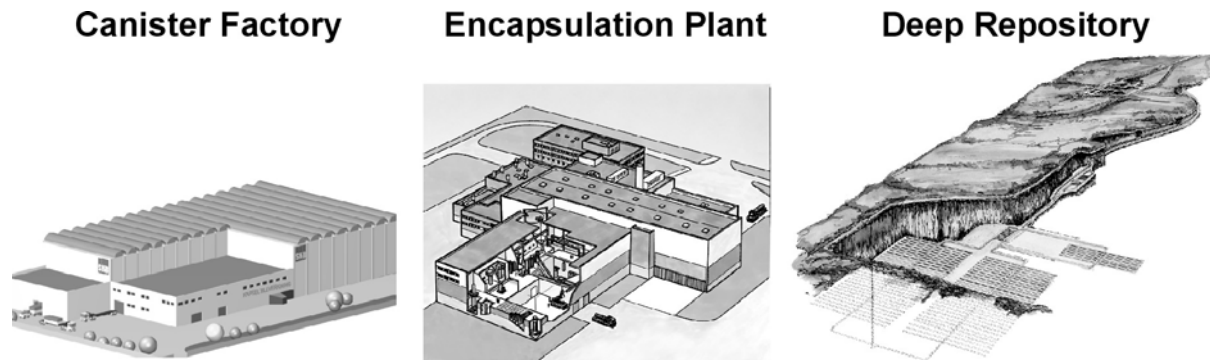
The planned facilities for encapsulation and final disposal of spent fuel
